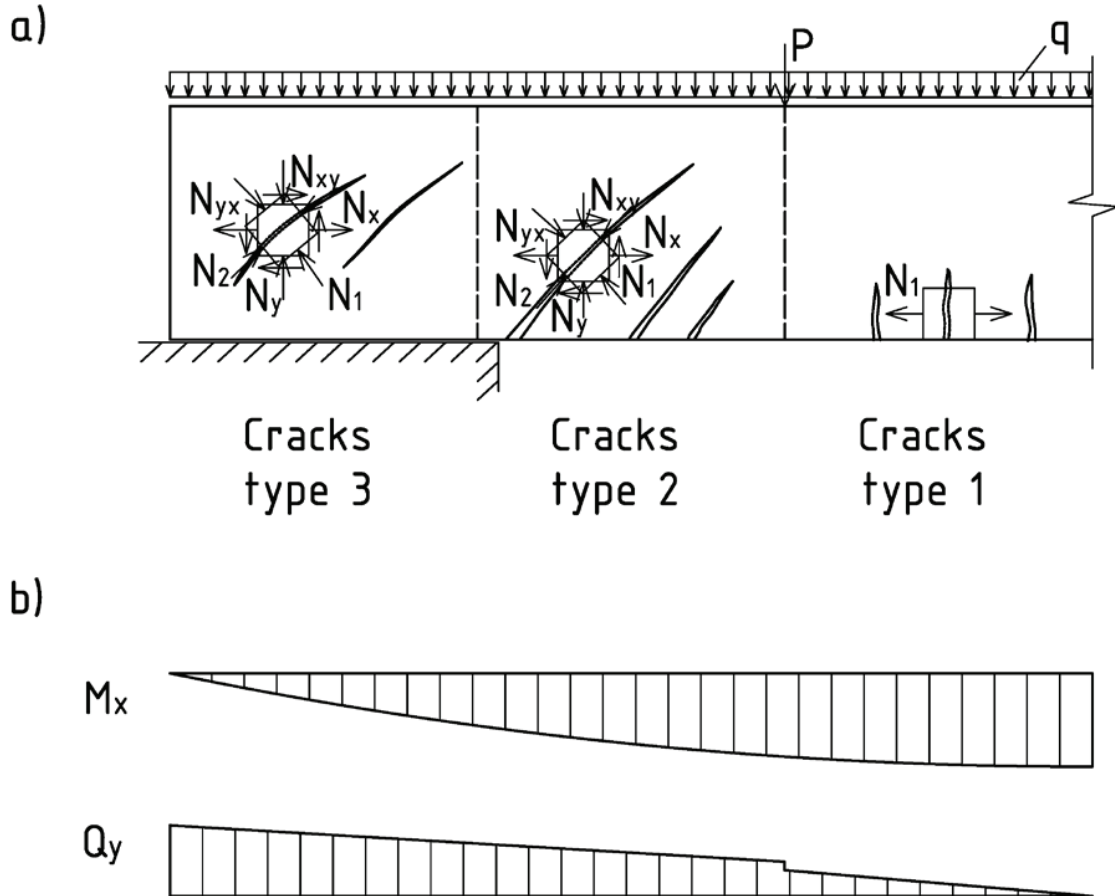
Typical stress states, crack types in plane stressed reinforced concrete elements (a) and bending moment and shear forces on the considered part of the beam (b)
